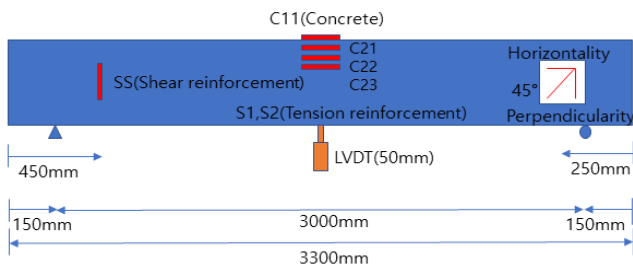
Instrumentation used for the beam flexural test(unit: mm)
